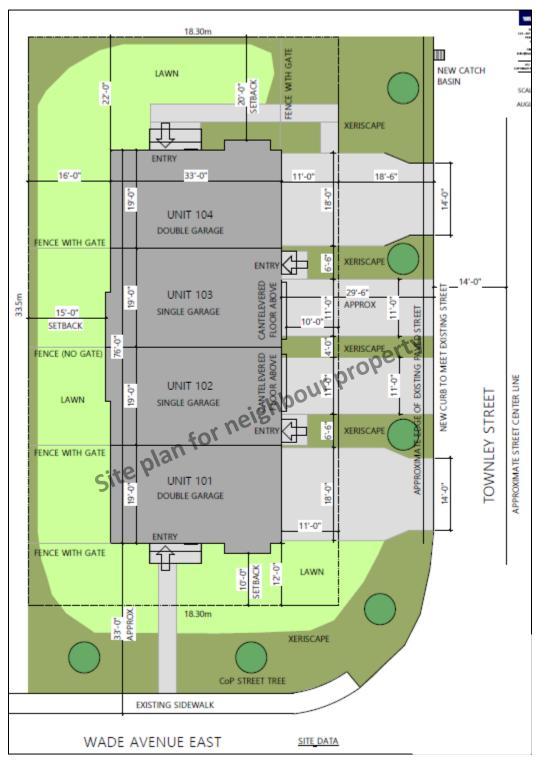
Conceptual Site Plan for 481 Wade Ave E (neighbour property)
